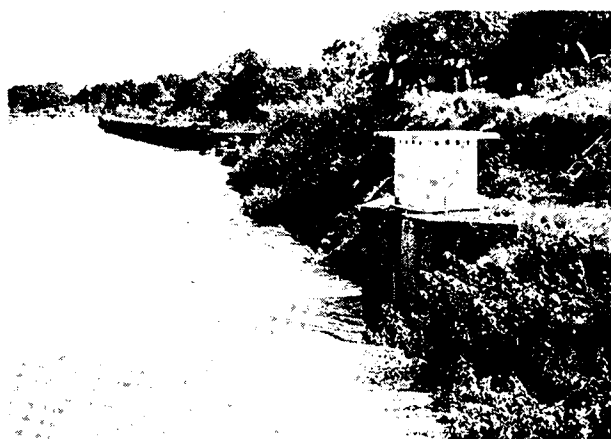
Water level recorder station set in river bank; stilling well made of masonry, house made of plastered brick, river bank protected against erosion by masonry wall (Cimanuk River at Tomo, Java, Indonesia).
